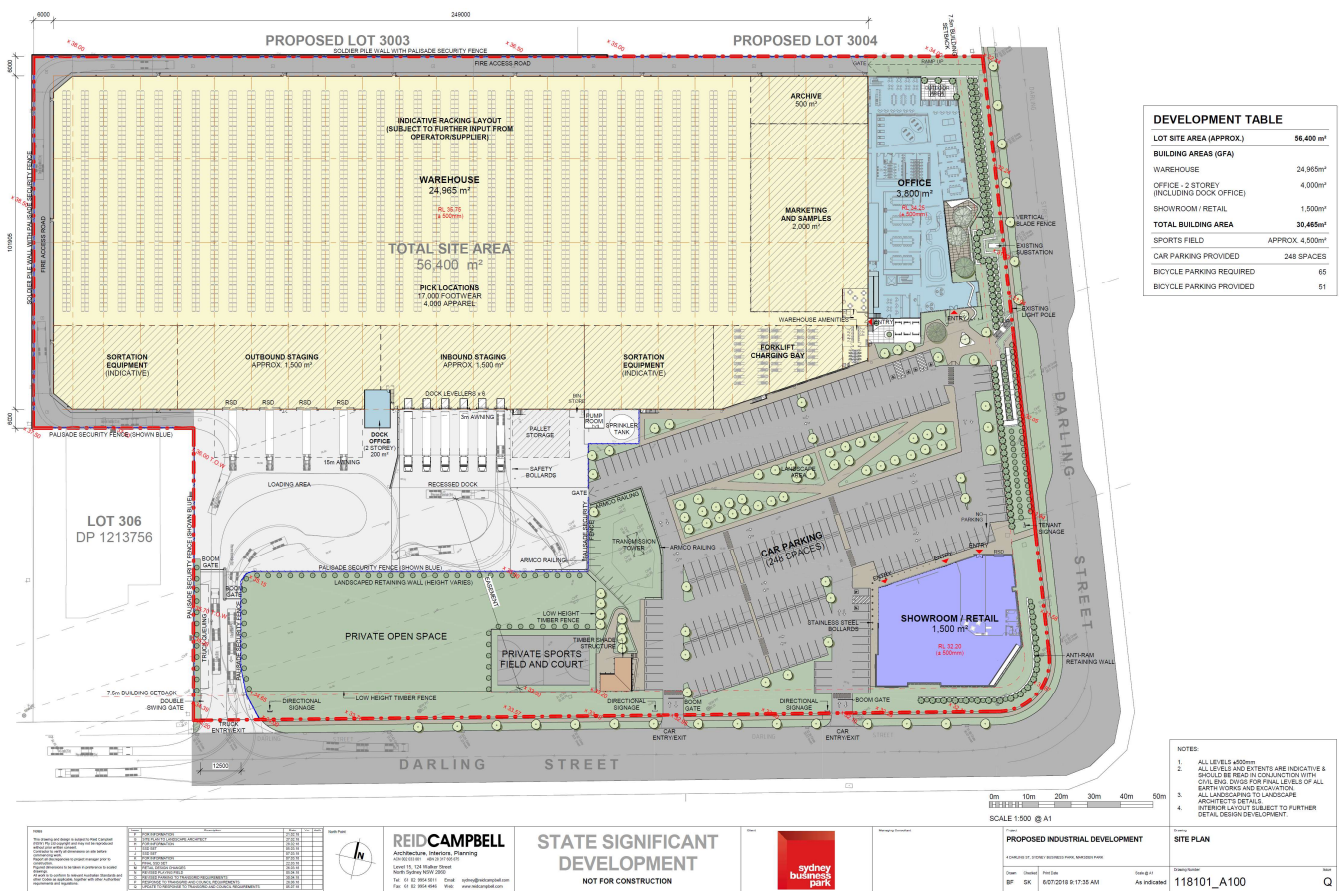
ASICS Facility Site Plan – As Proposed in RTS
